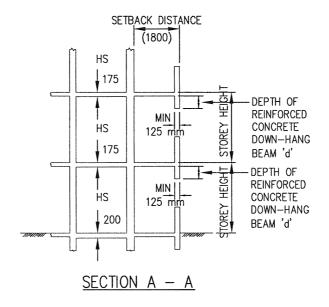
(a) REQUIREMENT ON SETBACK DISTANCE OF HS WALLS (WITH DOWN-HANG BEAM)
